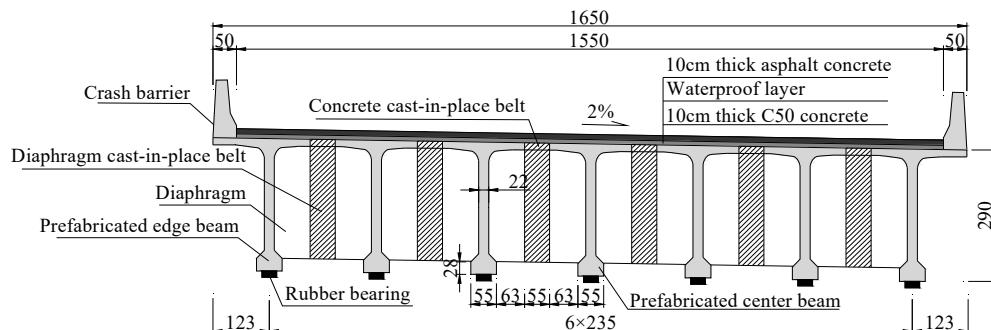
Scheme 1 cross section layout of bridge (unit: cm).
